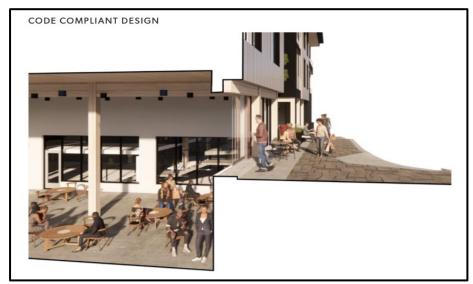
Sunken Hole at Street Corner (Project Plans Page 45)
